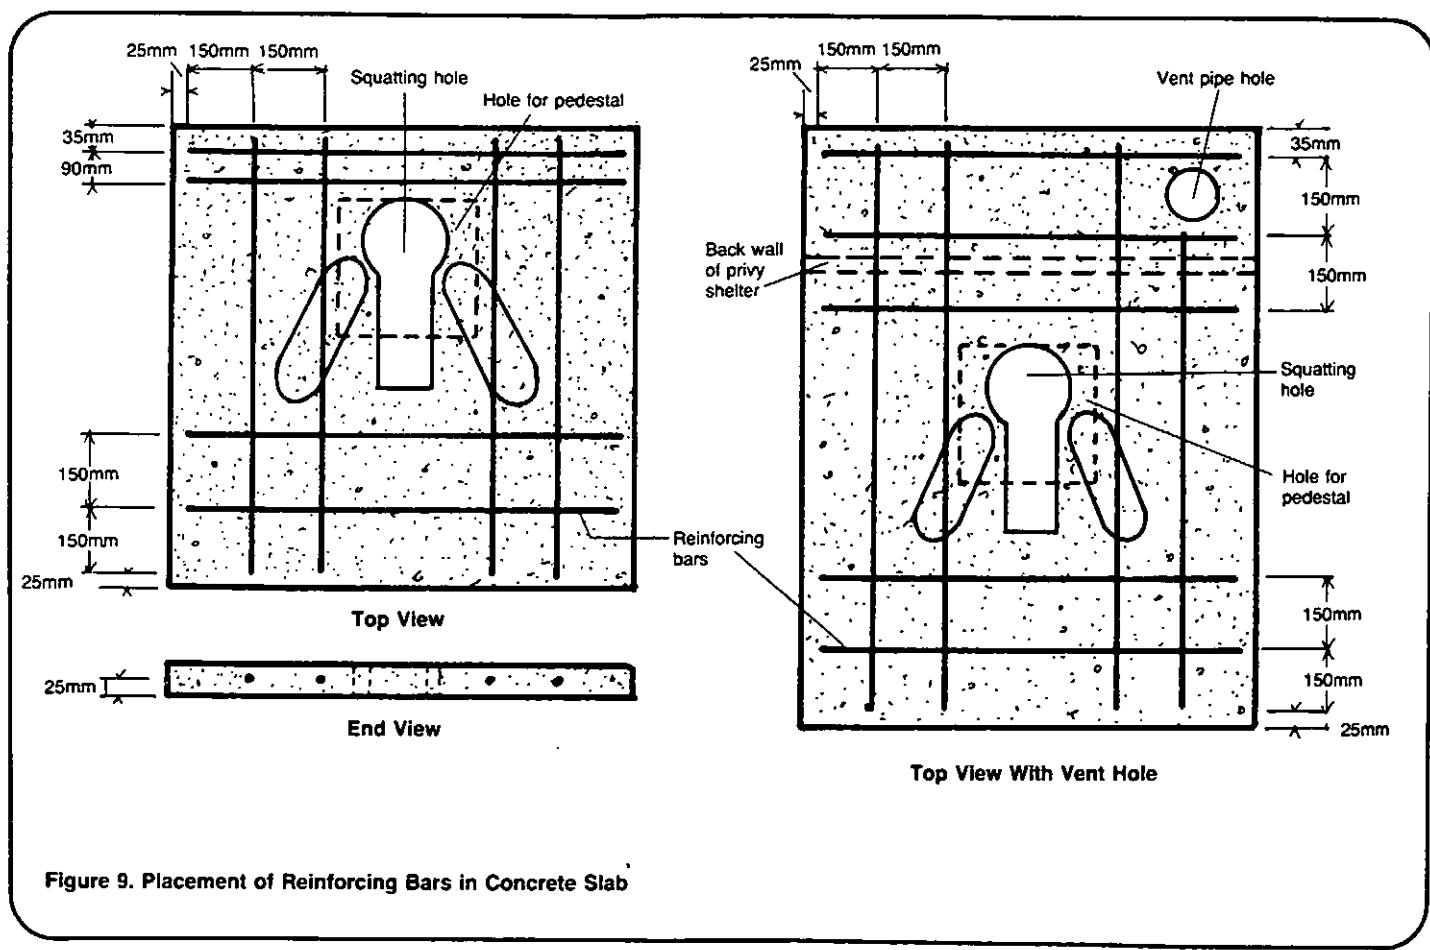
Placement of Reinforcing Bars in Concrete Slab
